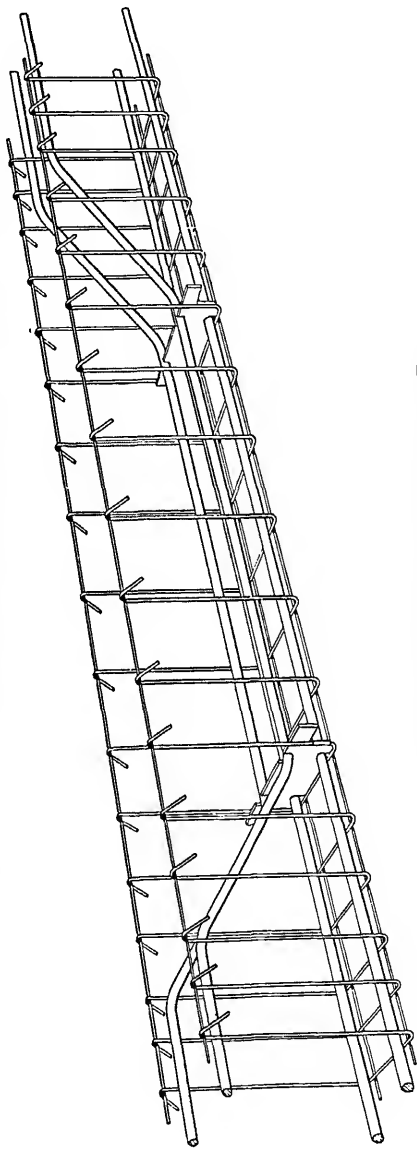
Design of Collapsible Reinforcing Bar Unit Frame
